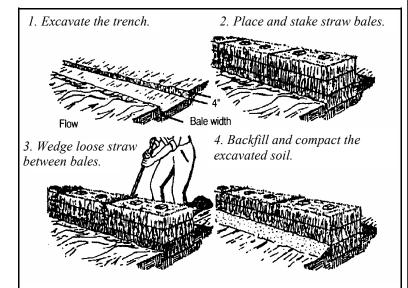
Constructing a straw bale barrier to slow runoff and prevent erosion.
